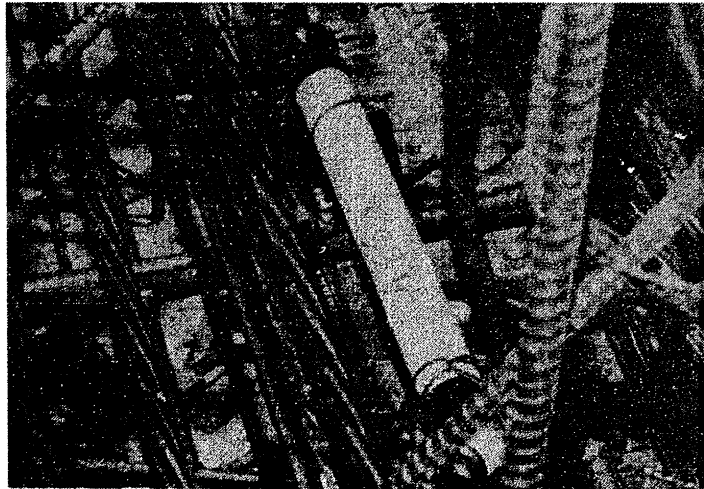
Carlson/RST strain gage prior to embedment in concrete for bridge deck monitoring (Federal Highway Administration, 1996).
